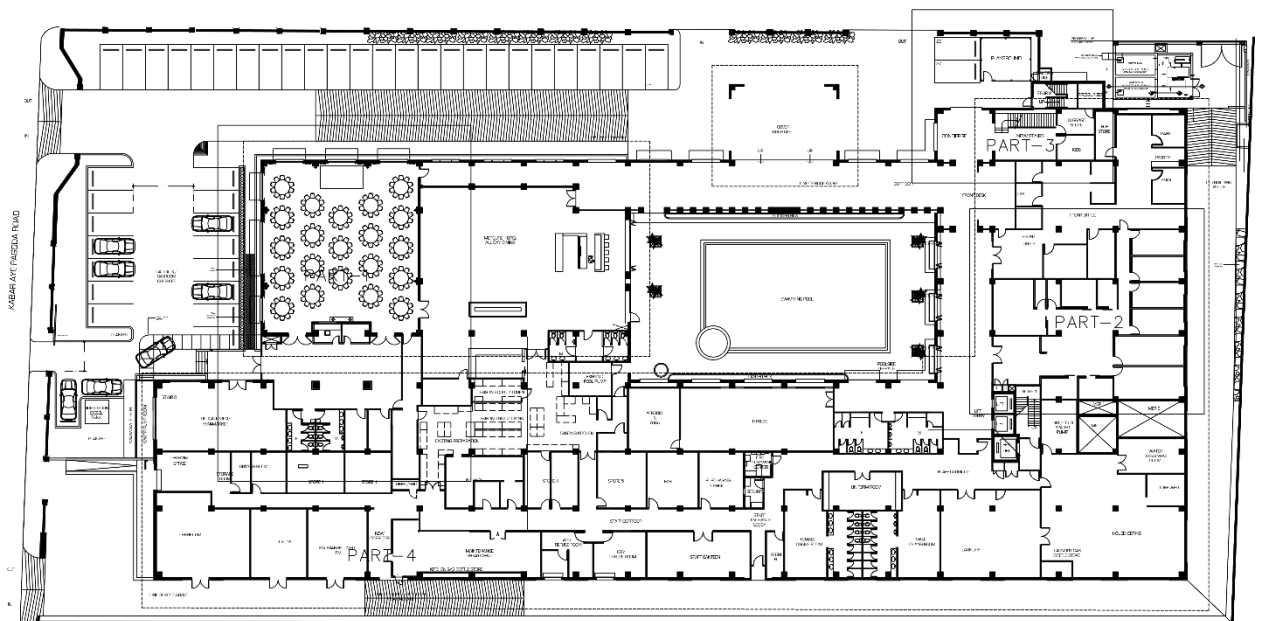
Floor plan of ground floor (Clear figure in Appendix-2)
